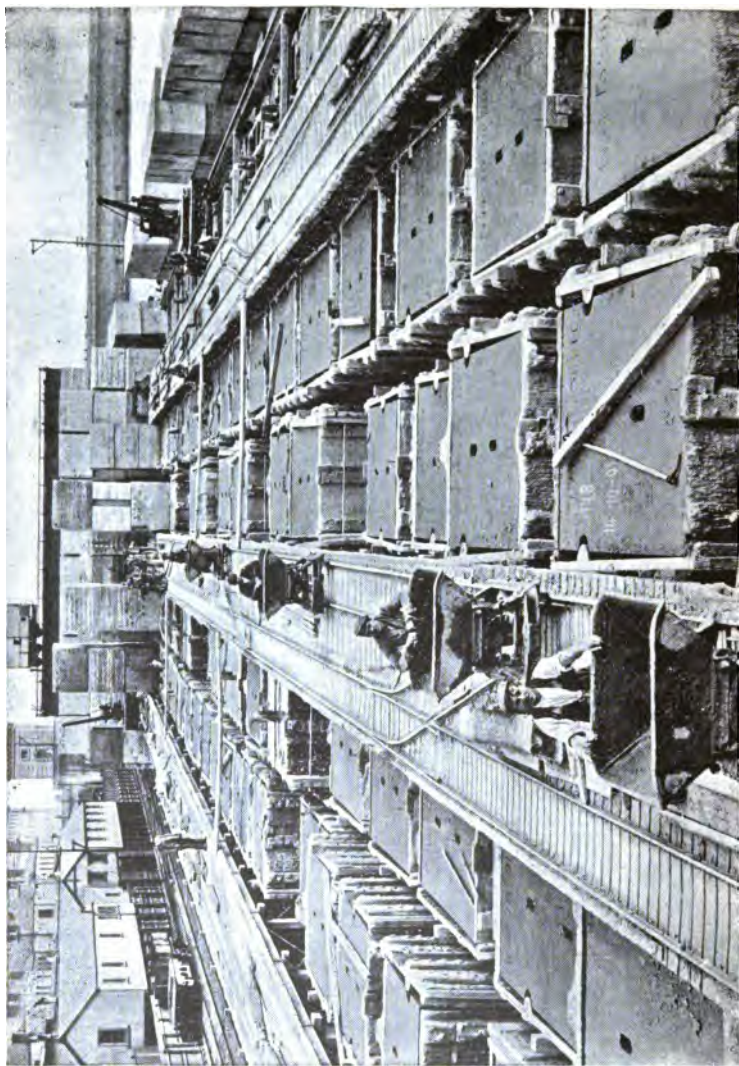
A blockmaking yard, Dover Harbor Works. Some of the concrete blocks weigh over 40 tons each.
